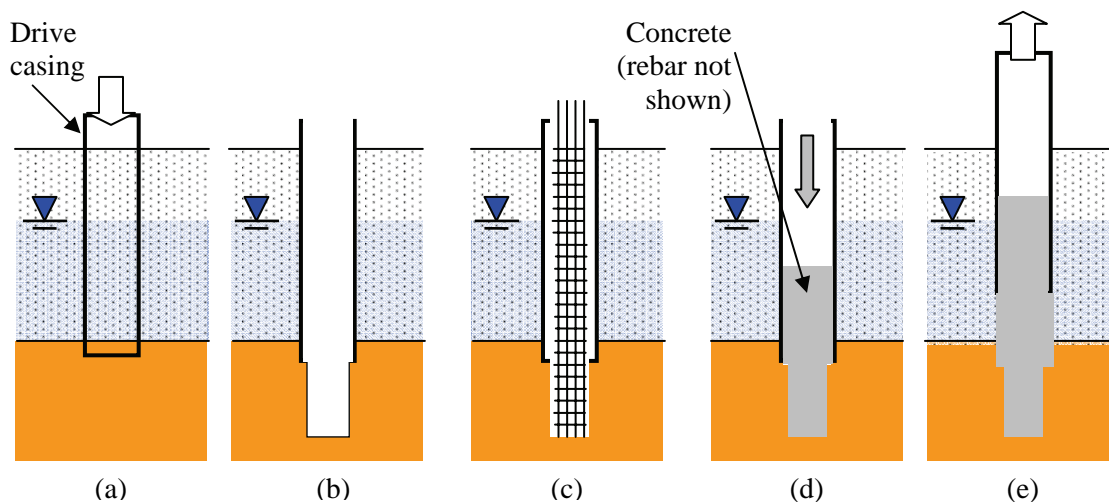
Construction Using Casing Advanced Ahead of Excavation: (a) drive casing into bearing stratum; (b) drill through casing; (c) complete and clean hole, set reinforcing; (d) place concrete to head greater than external water pressure; (e) pull casing while adding concrete
